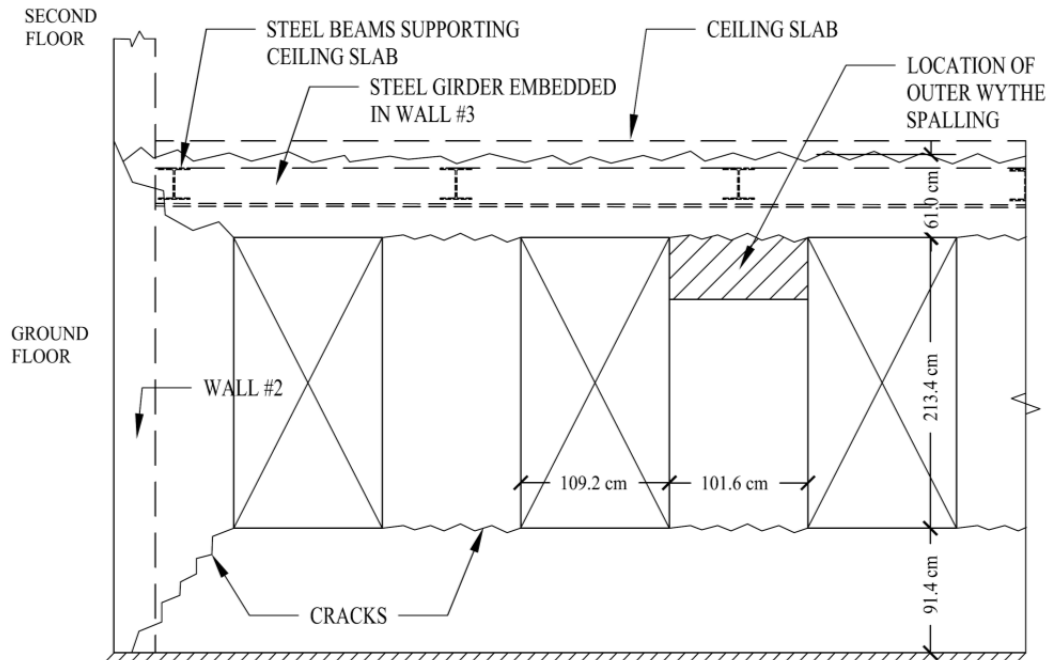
Post-test crack/damage pattern of larger bearing wall (Wall #3) at ground floor level, outside blast chamber looking in.
